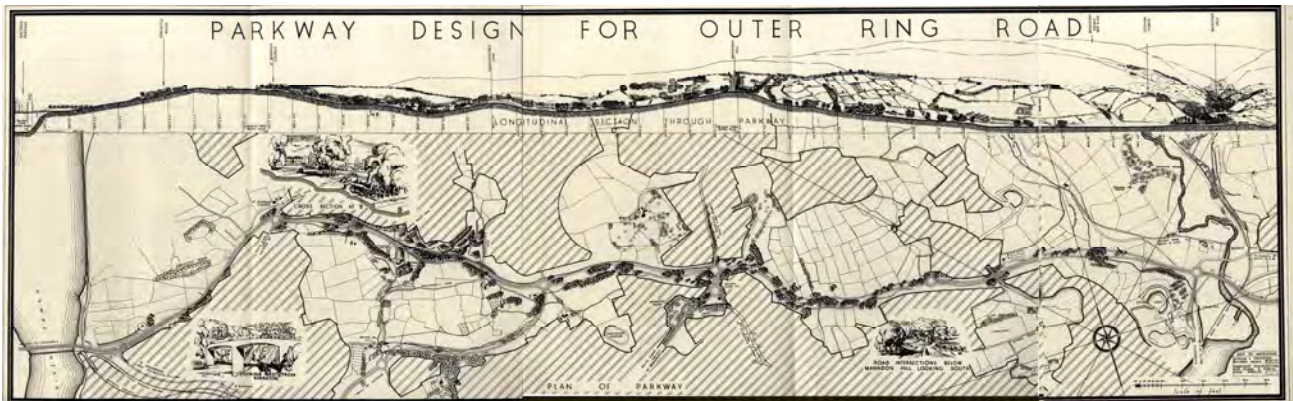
Traditional plan and section of the parkway design for outer ring road – City of Plymouth 1943
